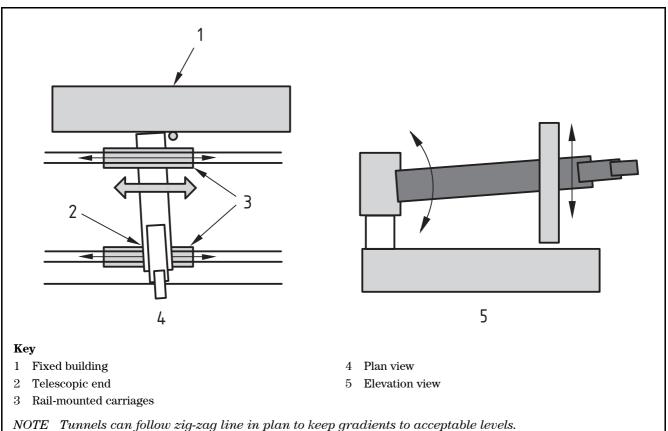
Passenger walkways – Type C – Traversing drawbridge on boarding pod
